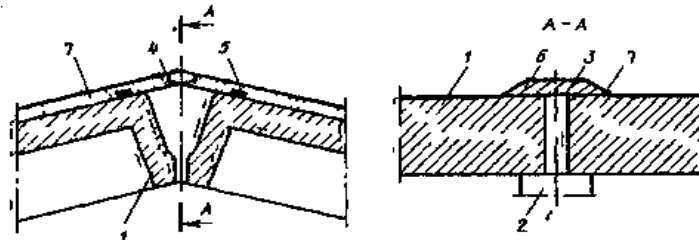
Roof structure with concrete impregnation of reinforced concrete panels and sealing of seams with non-hardening mastics
